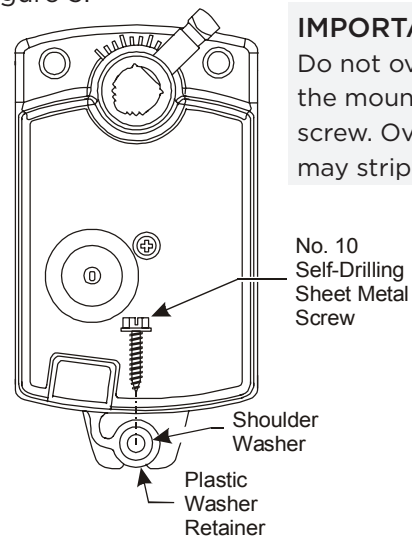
Mounting the Actuator onto the Damper Shaft
